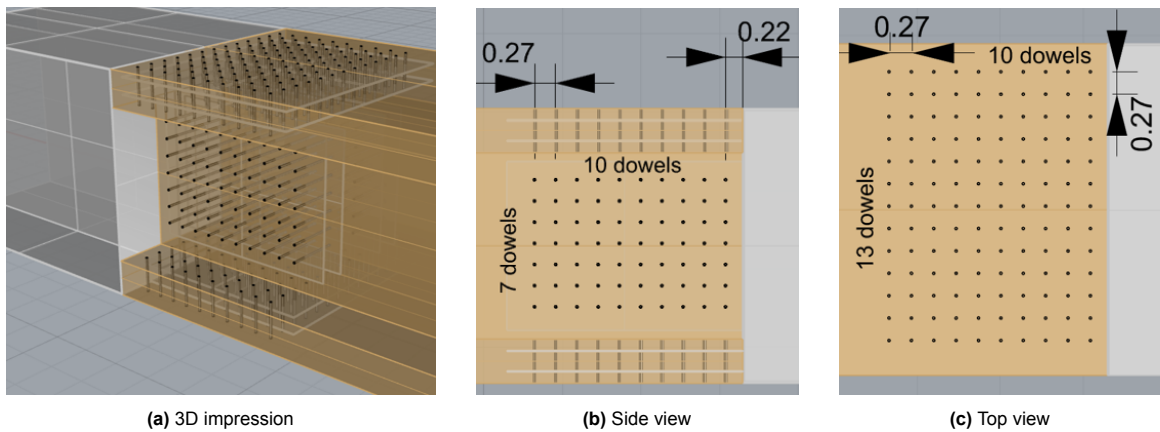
Dowel-type connection in Rhino with dimensions. Double slotted-in steel plates with the required amount of dowels and spacing.
